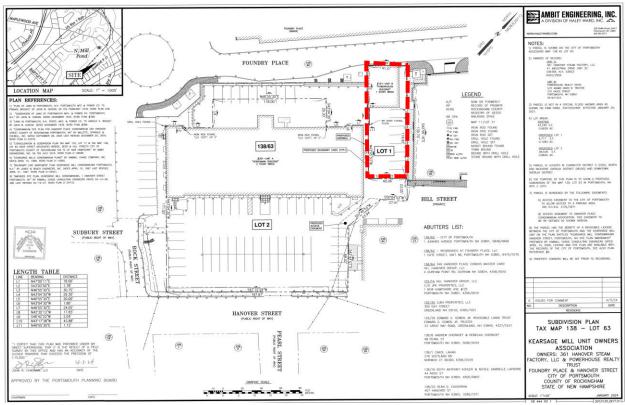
Proposed Subdivision Plan for the Powerhouse Building/"Adams" Parcel (4,717 SF)
